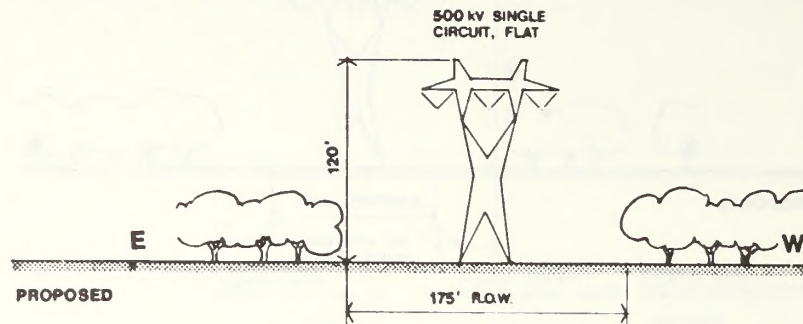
TYPICAL CORRIDOR IN THE RAMSEY CANYON-MERIDIAN SUBSTATION SEGMENT OF DRAFT PREFERRED ALTERNATIVE
